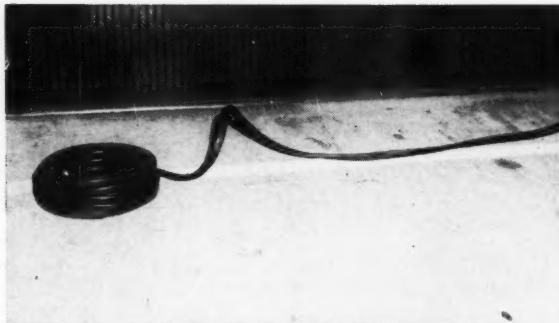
When cable is pulled out of a supply coil it twists, which leads to later kinking
